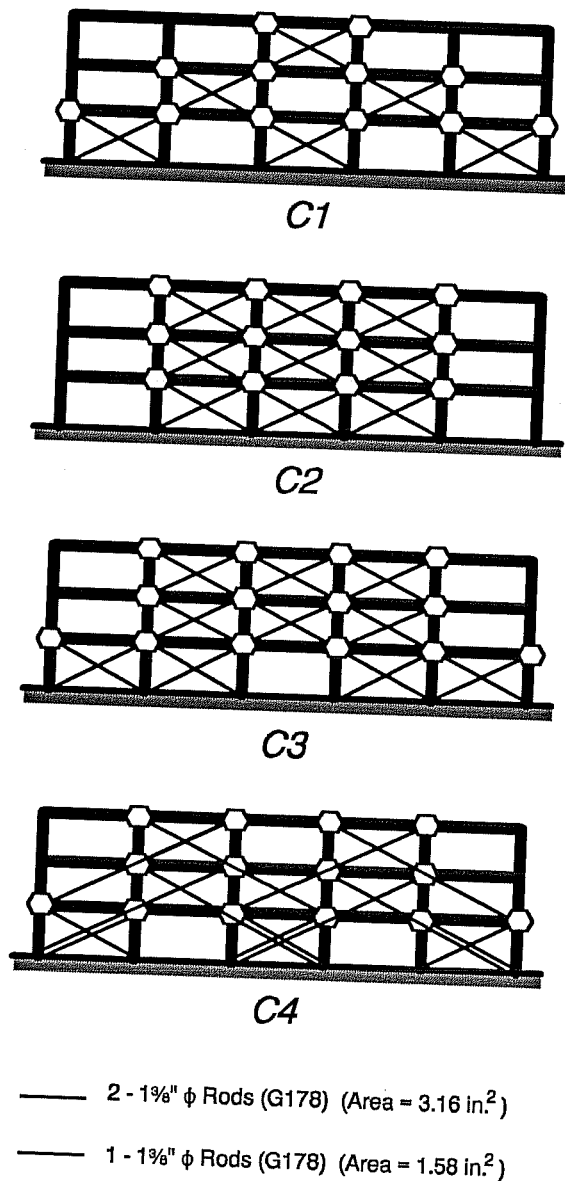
Bracing configurations for the three-story building with post-tensioned bracing system (perimeter frames only).
